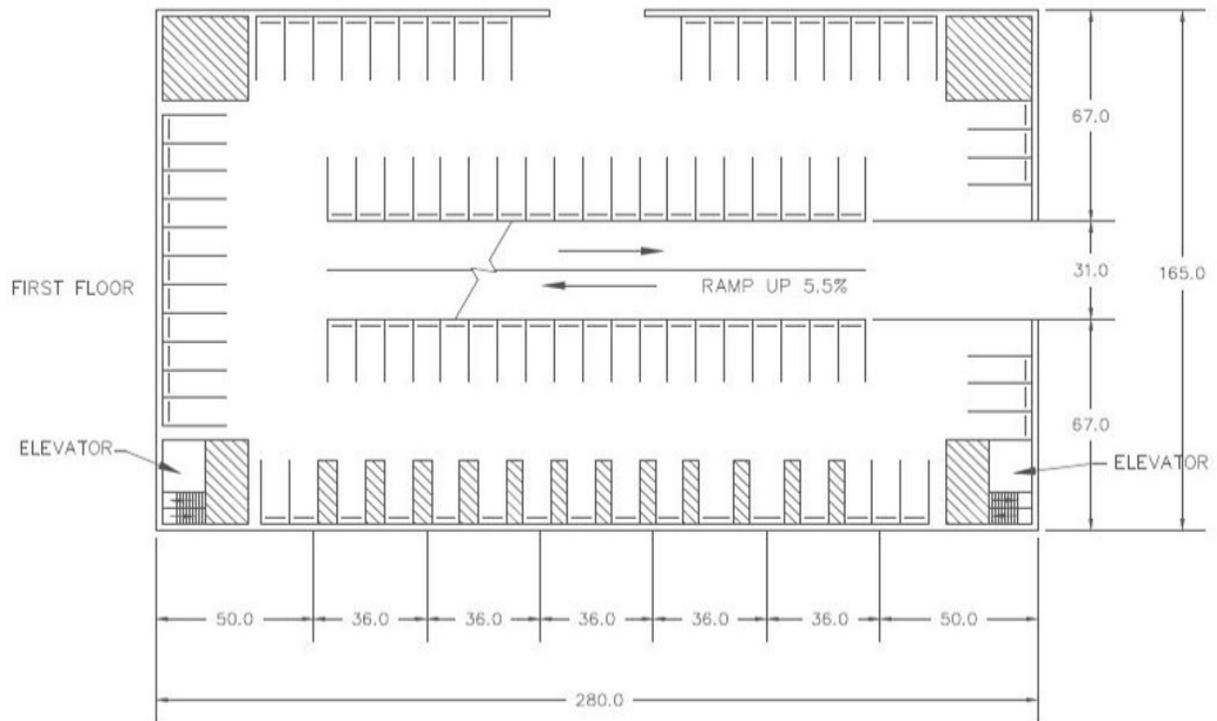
Typical Drawing of Parking Garage (Regina Barton)
